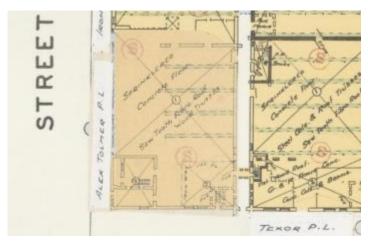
Extract from Mahlstedt's Plan 'City of South Melbourne and section of Port Melbourne detail-fire-survey ', Mahlstedt's (Vic) Pty Ltd 1950
